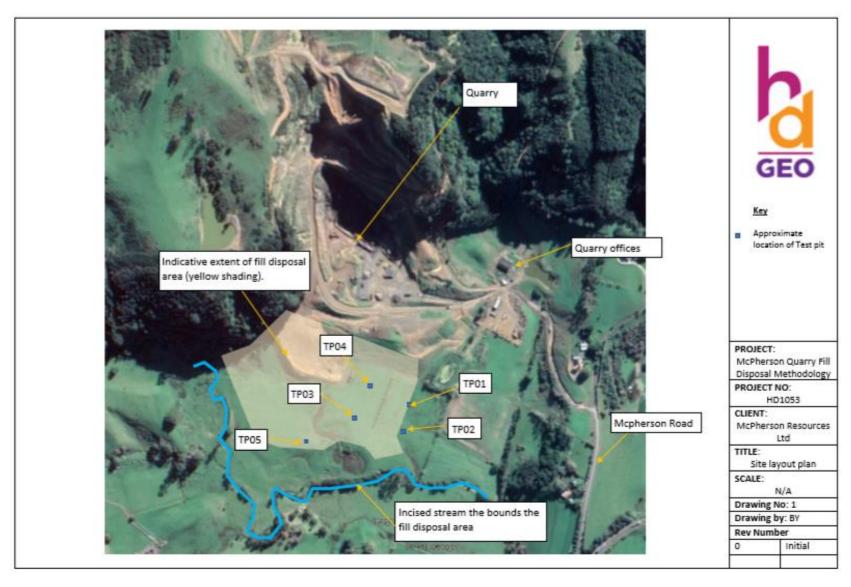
Proposed Cleanfill and Overburden Placement Footprint, shaded area south of quarry
